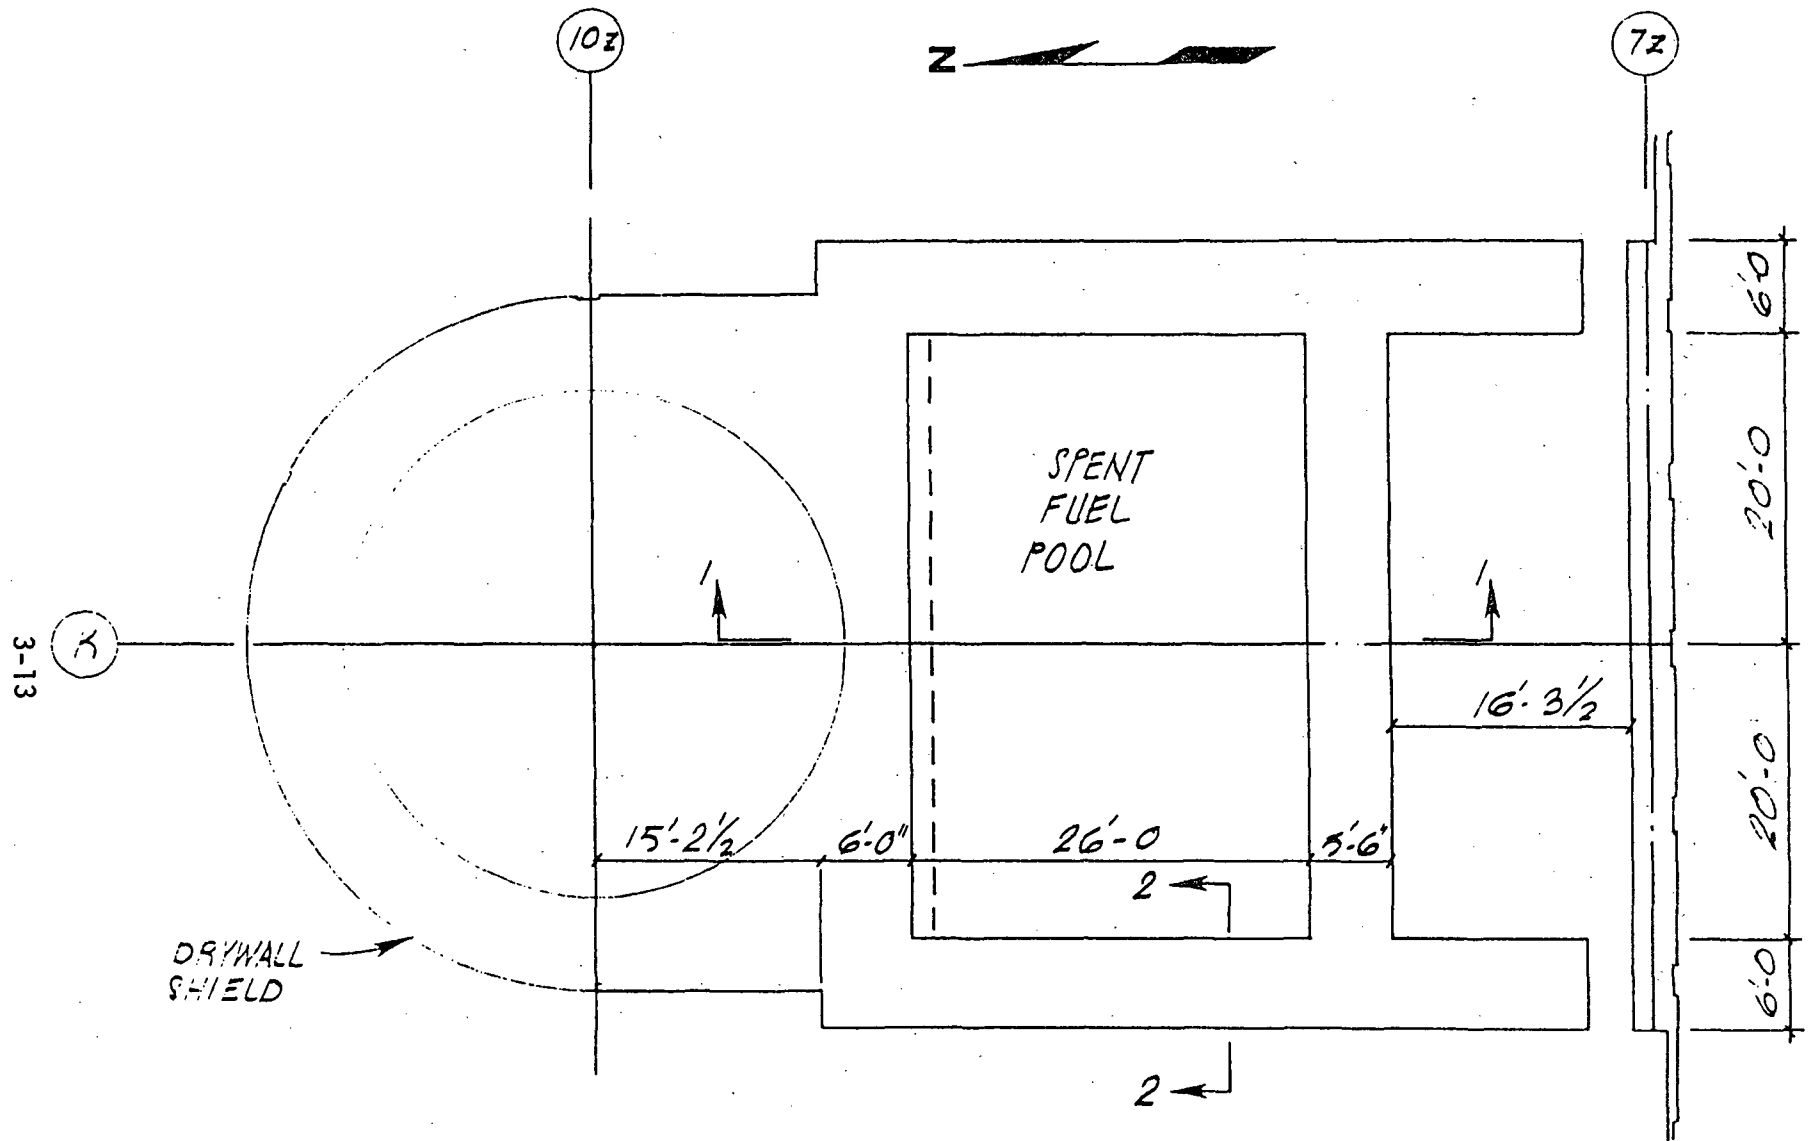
Reactor Building Plan at Elevation 303'-0"
